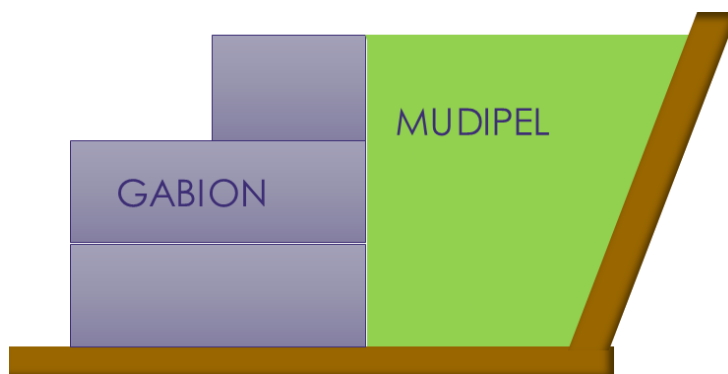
SKETCH OF THE RETAINING WALL STRUCTURE
